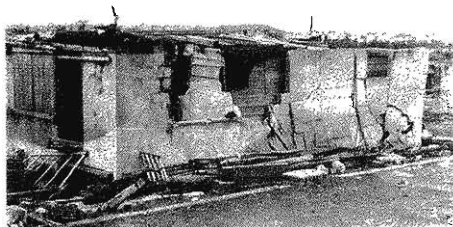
Damage to a masonry building : complete removal of the roof.
